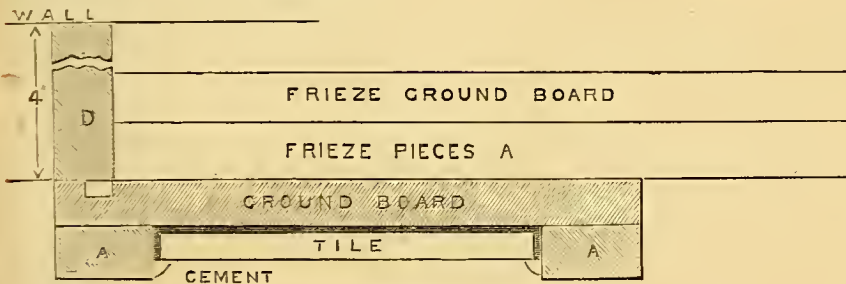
TRANSVERSE SECTION OF PILASTER.
